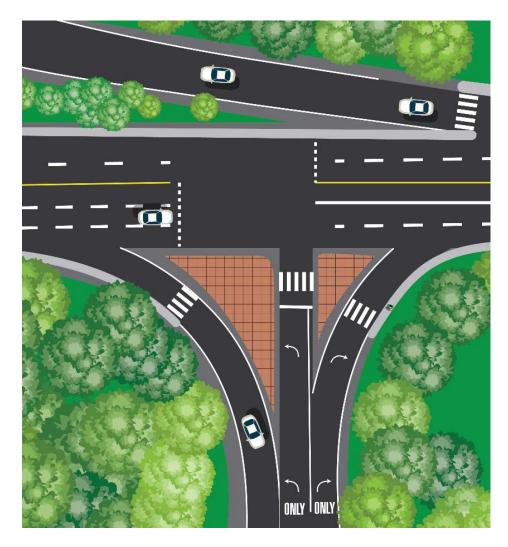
Typical ramp intersection with a local roadway. In general, ramp intersections are associated with roadway characteristics that produce a high level of traffic stress. In this scenario, pedestrians are provided with sidewalks and marked crosswalks; however, those features are not always present. Even with such features, additional crossing enhancements may be needed where traffic volumes and speeds are high. Note in this scenario there are no bike lanes present and the turn radii onto and off the ramps allows drivers to maintain a high rate of speed as they merge, creating a difficult situation for bicyclists.
